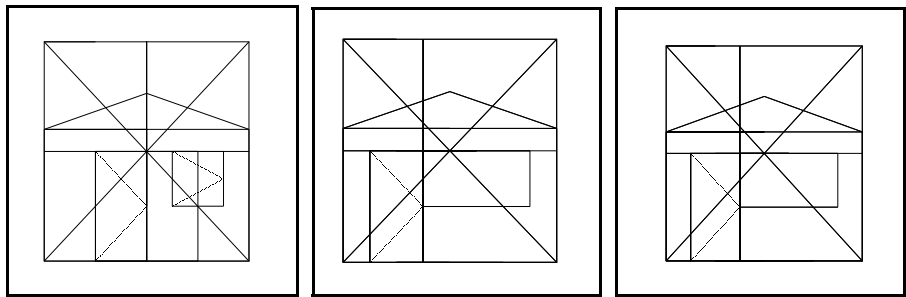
, 8, 9. Prefabricated panel, door and window alternatives
